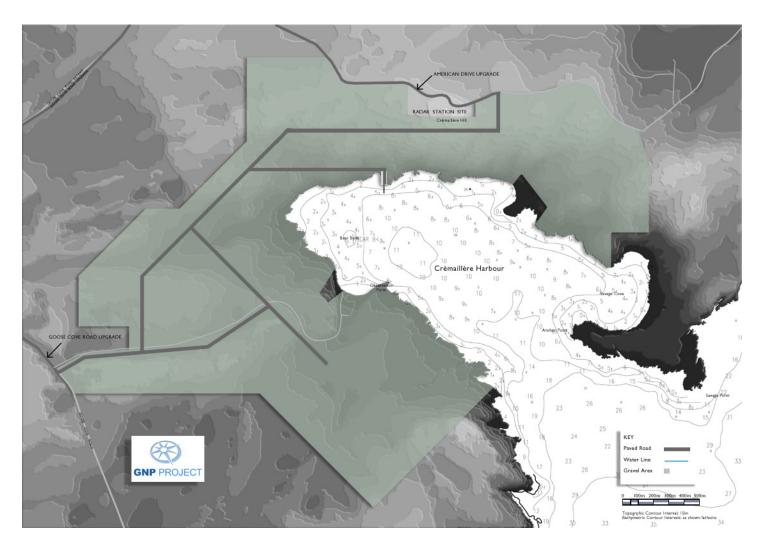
GNP Road Upgrade. American Drive and Goose Cove Road will be upgraded from the intersection of Route 430 and West Street as far as the north and west gates of the GNP project site.
